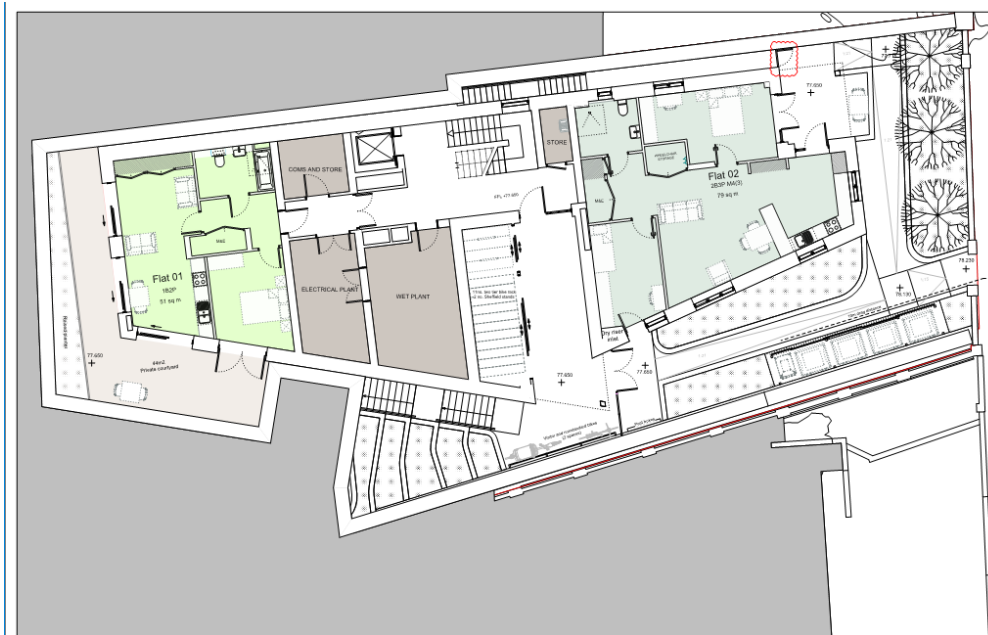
Proposed lower ground floor with rear of plan set into the slope and front level with the street
